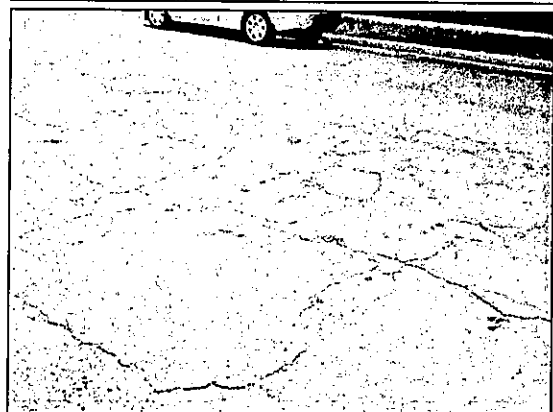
Beverly Drive asphalt pavement is generally in very poor condition.
